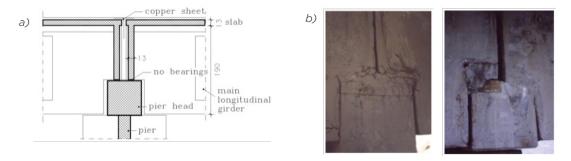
Details of superstructure resting on the pier a) without bearings (Šavor, et al., 2009) and b) cracking of girder and pier head (HIMK-Croatian Institute for bridges and structures, 2002)
